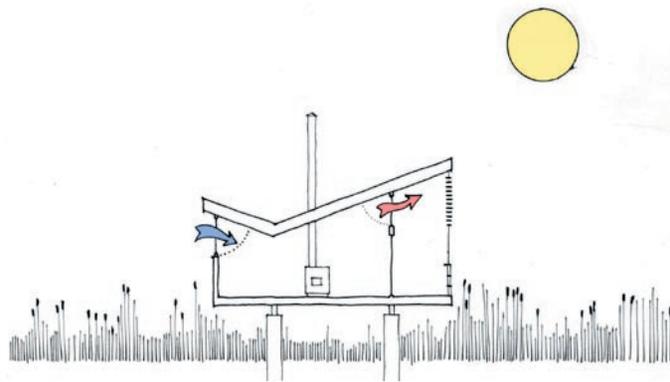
| Summer shading diagram. Bris-soleil on the south side of the cottage provide shade. Generous operable windows allow cross ventilation.
